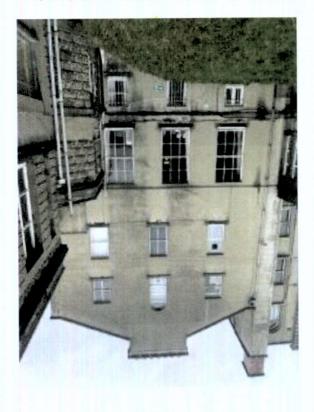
Southern elevation of Building A, with the Archive (Building F) to the left and the Finlay wing (Building E) to the right.
